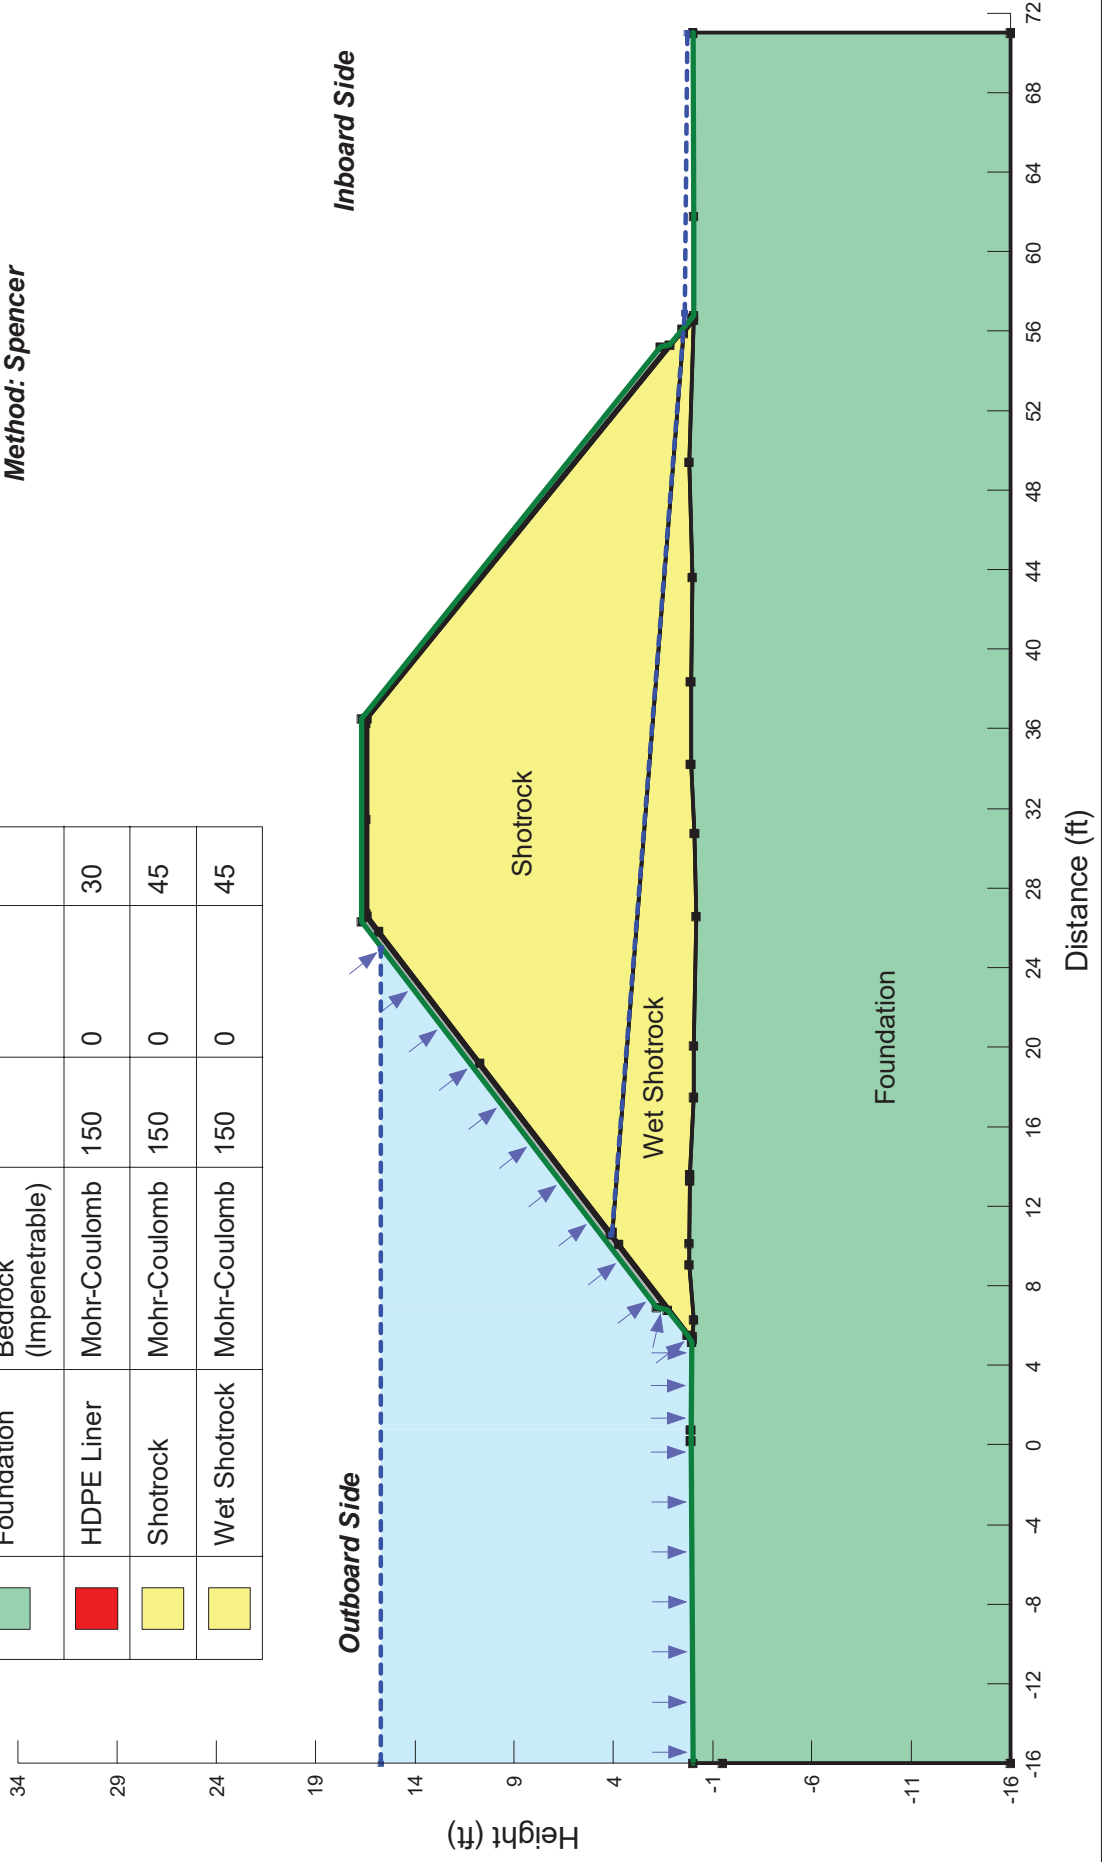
Typical Section (Reinforced); Outboard Slope Failure Result
